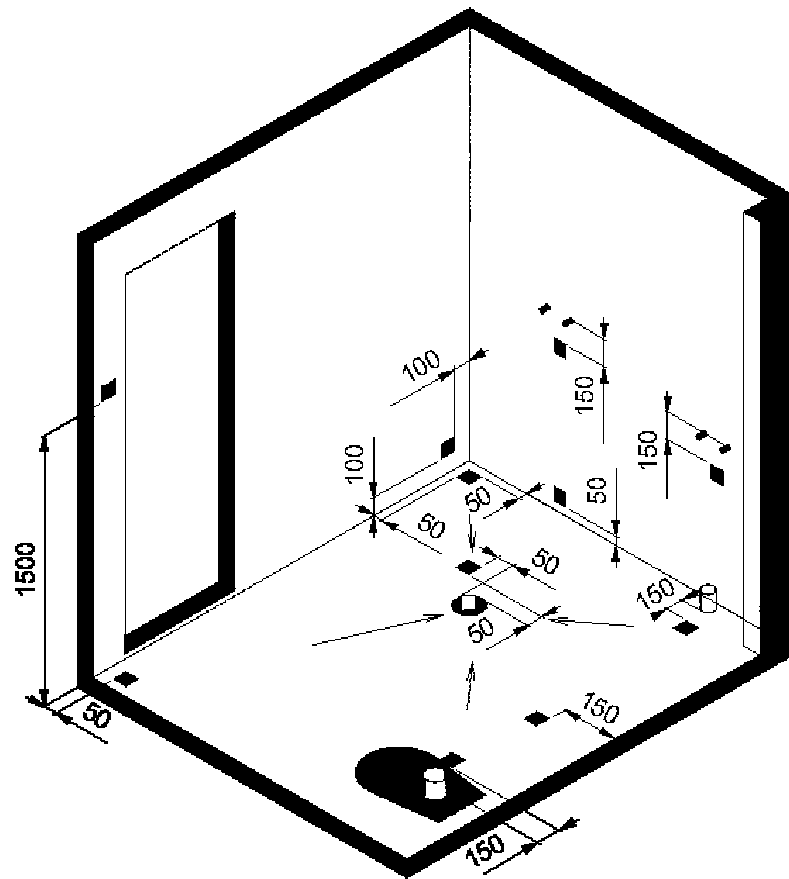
Possible assembly locations in a bathroom, distances shown in millimetres.
